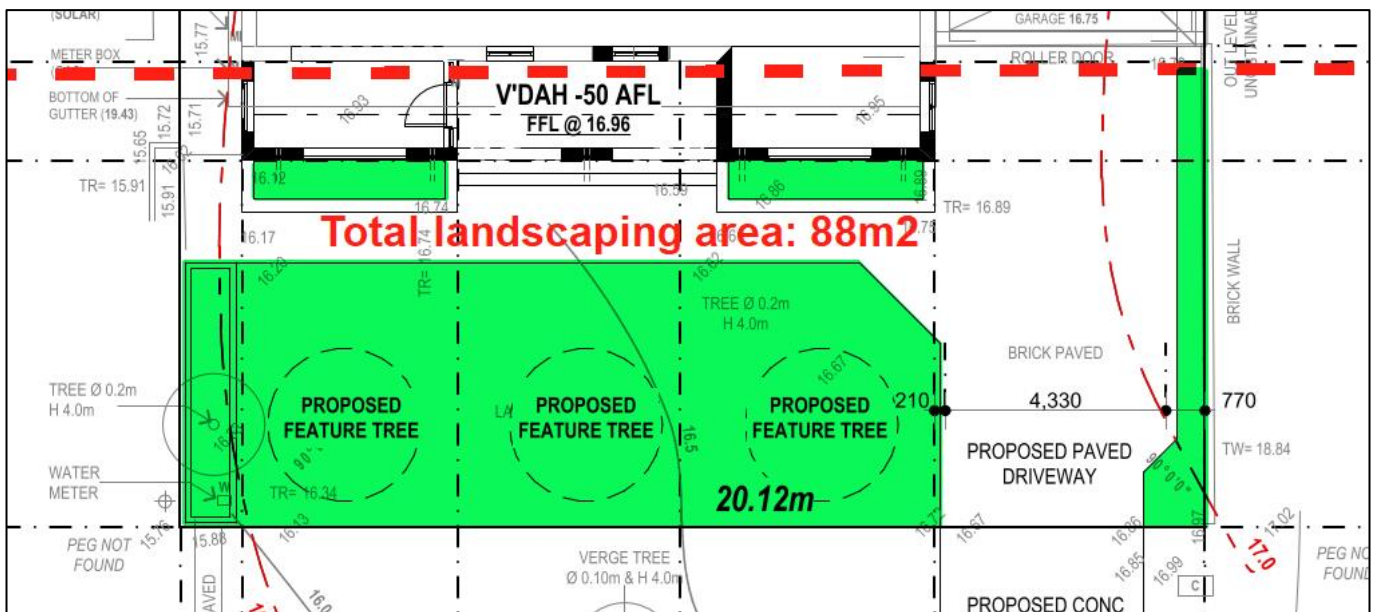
Marked-up site plan showing the total area of landscaping within the street setback area.
